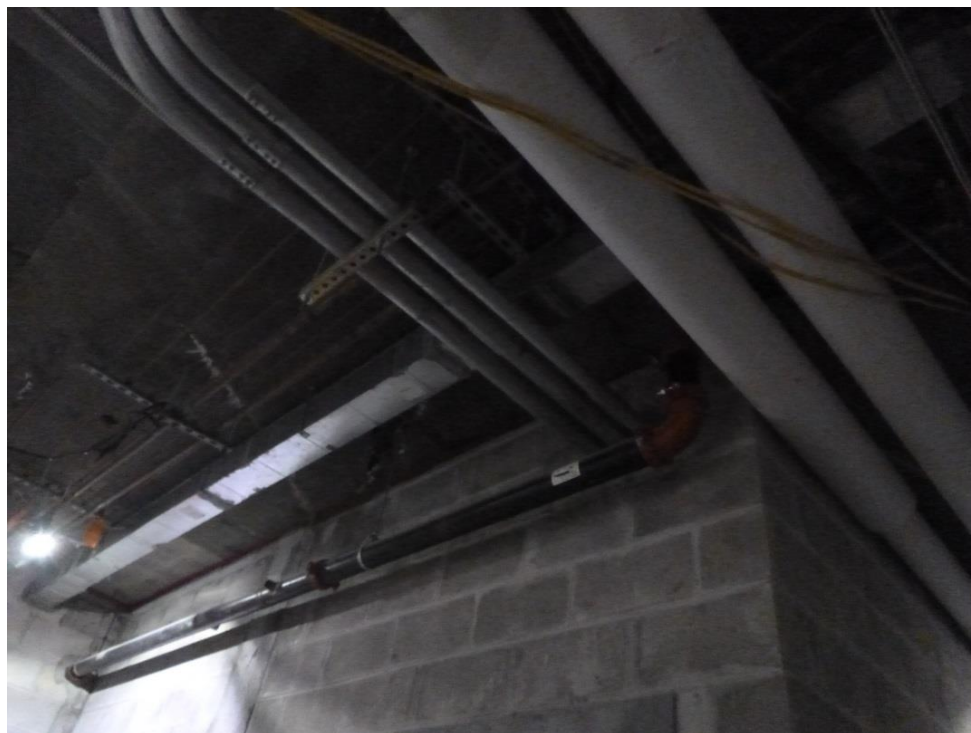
, 03/01/2017: View of garage ventilation system ducts and SMD riser piping along the cellar ceiling (facing southwest).
